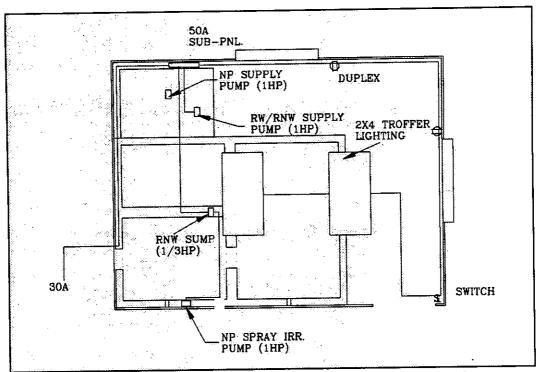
Greywater facility electrical requirements plan. Grosskopf, Kevin R. University of Florida, 1994.
